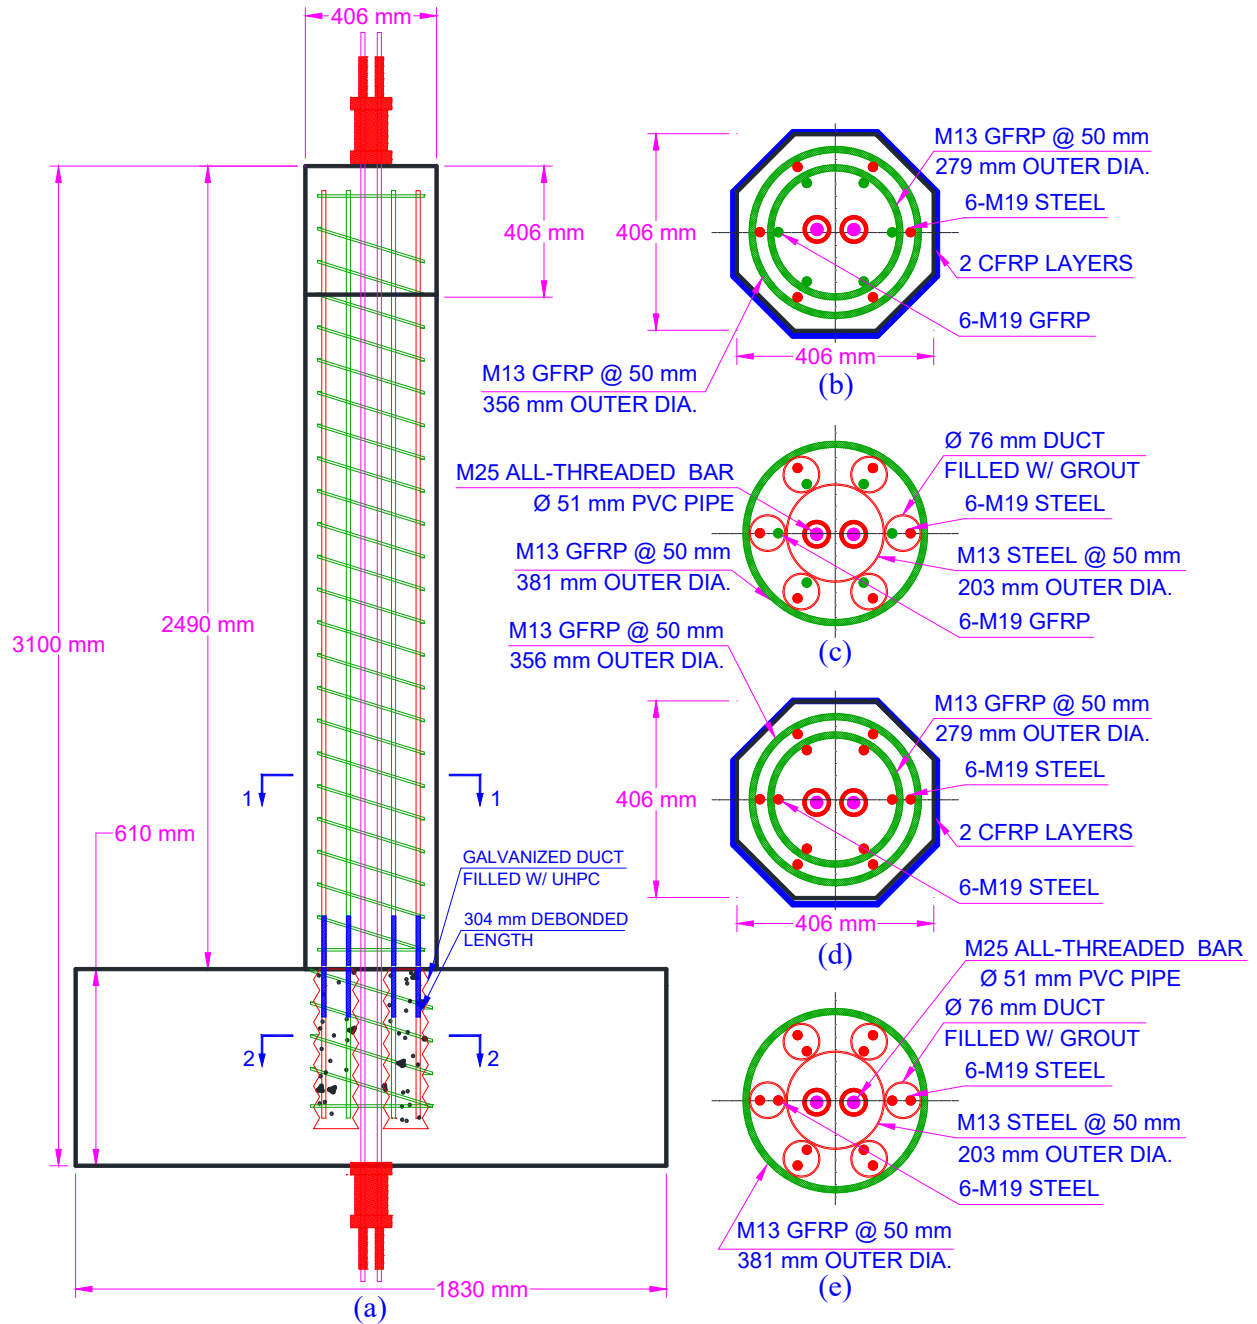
PT column configuration: (a) side view; (b) section 1-1 PT-HYB column; (c) section 2-2 PT-HYB column; (d) section 1-1 PT-STL column; (e) section 2-2PT- STL column
